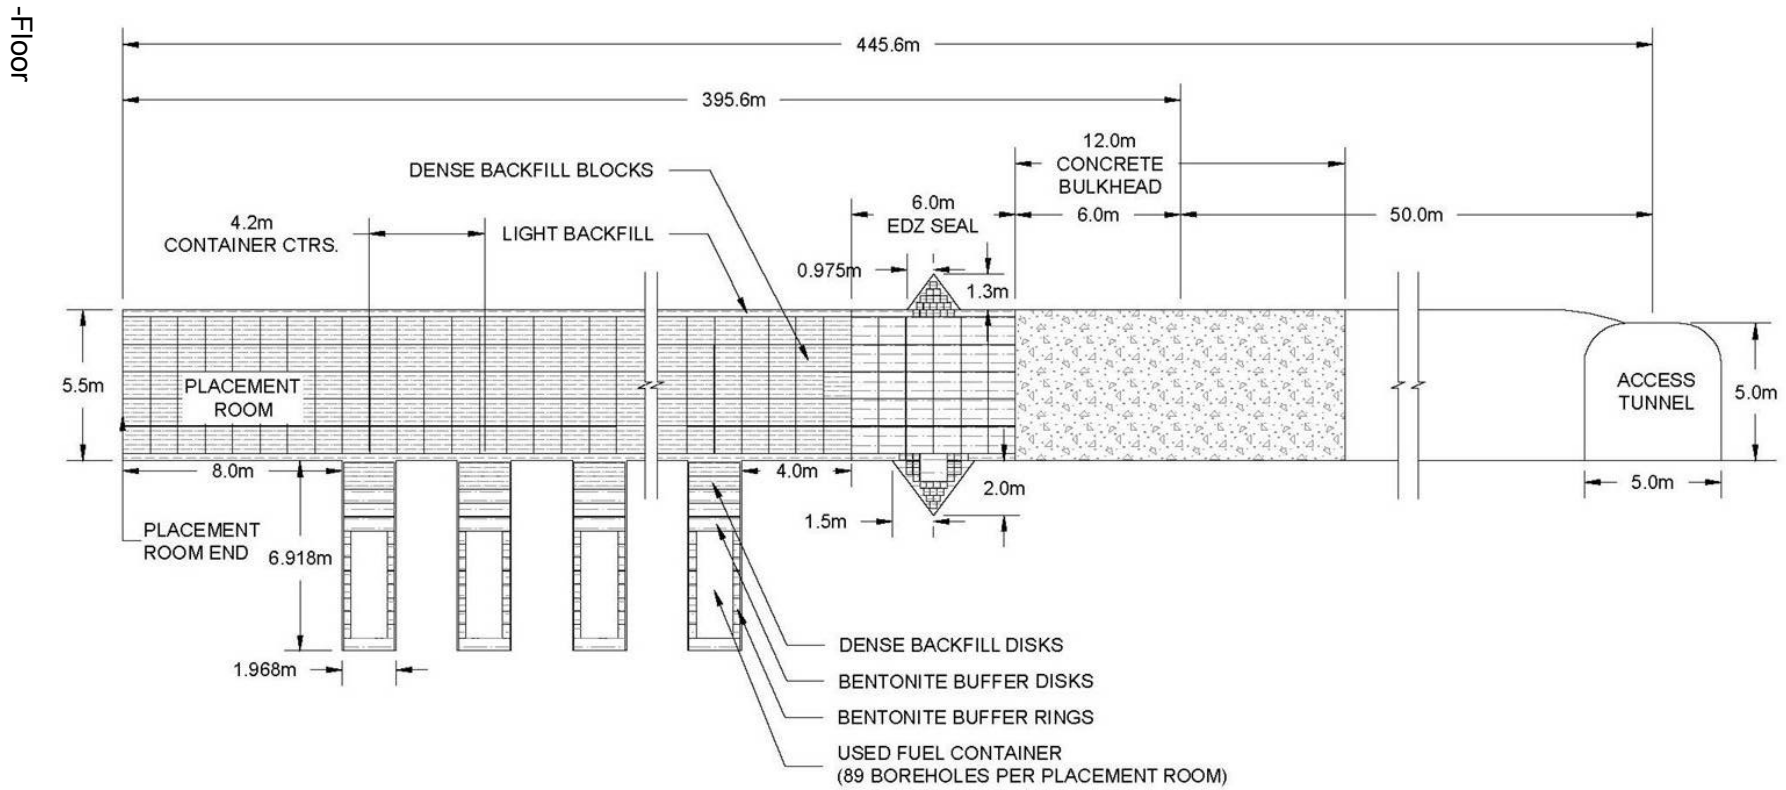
Longitudinal Section of the Container Placement Room - In Floor Borehole Configuration
